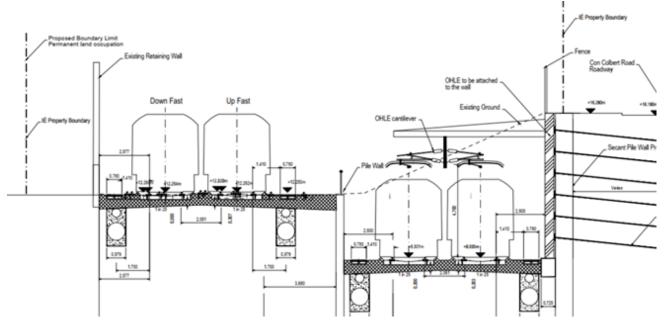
Chapelizod Bypass (Con Colbert Road) Retaining Wall & Ground Anchors – Facing West
